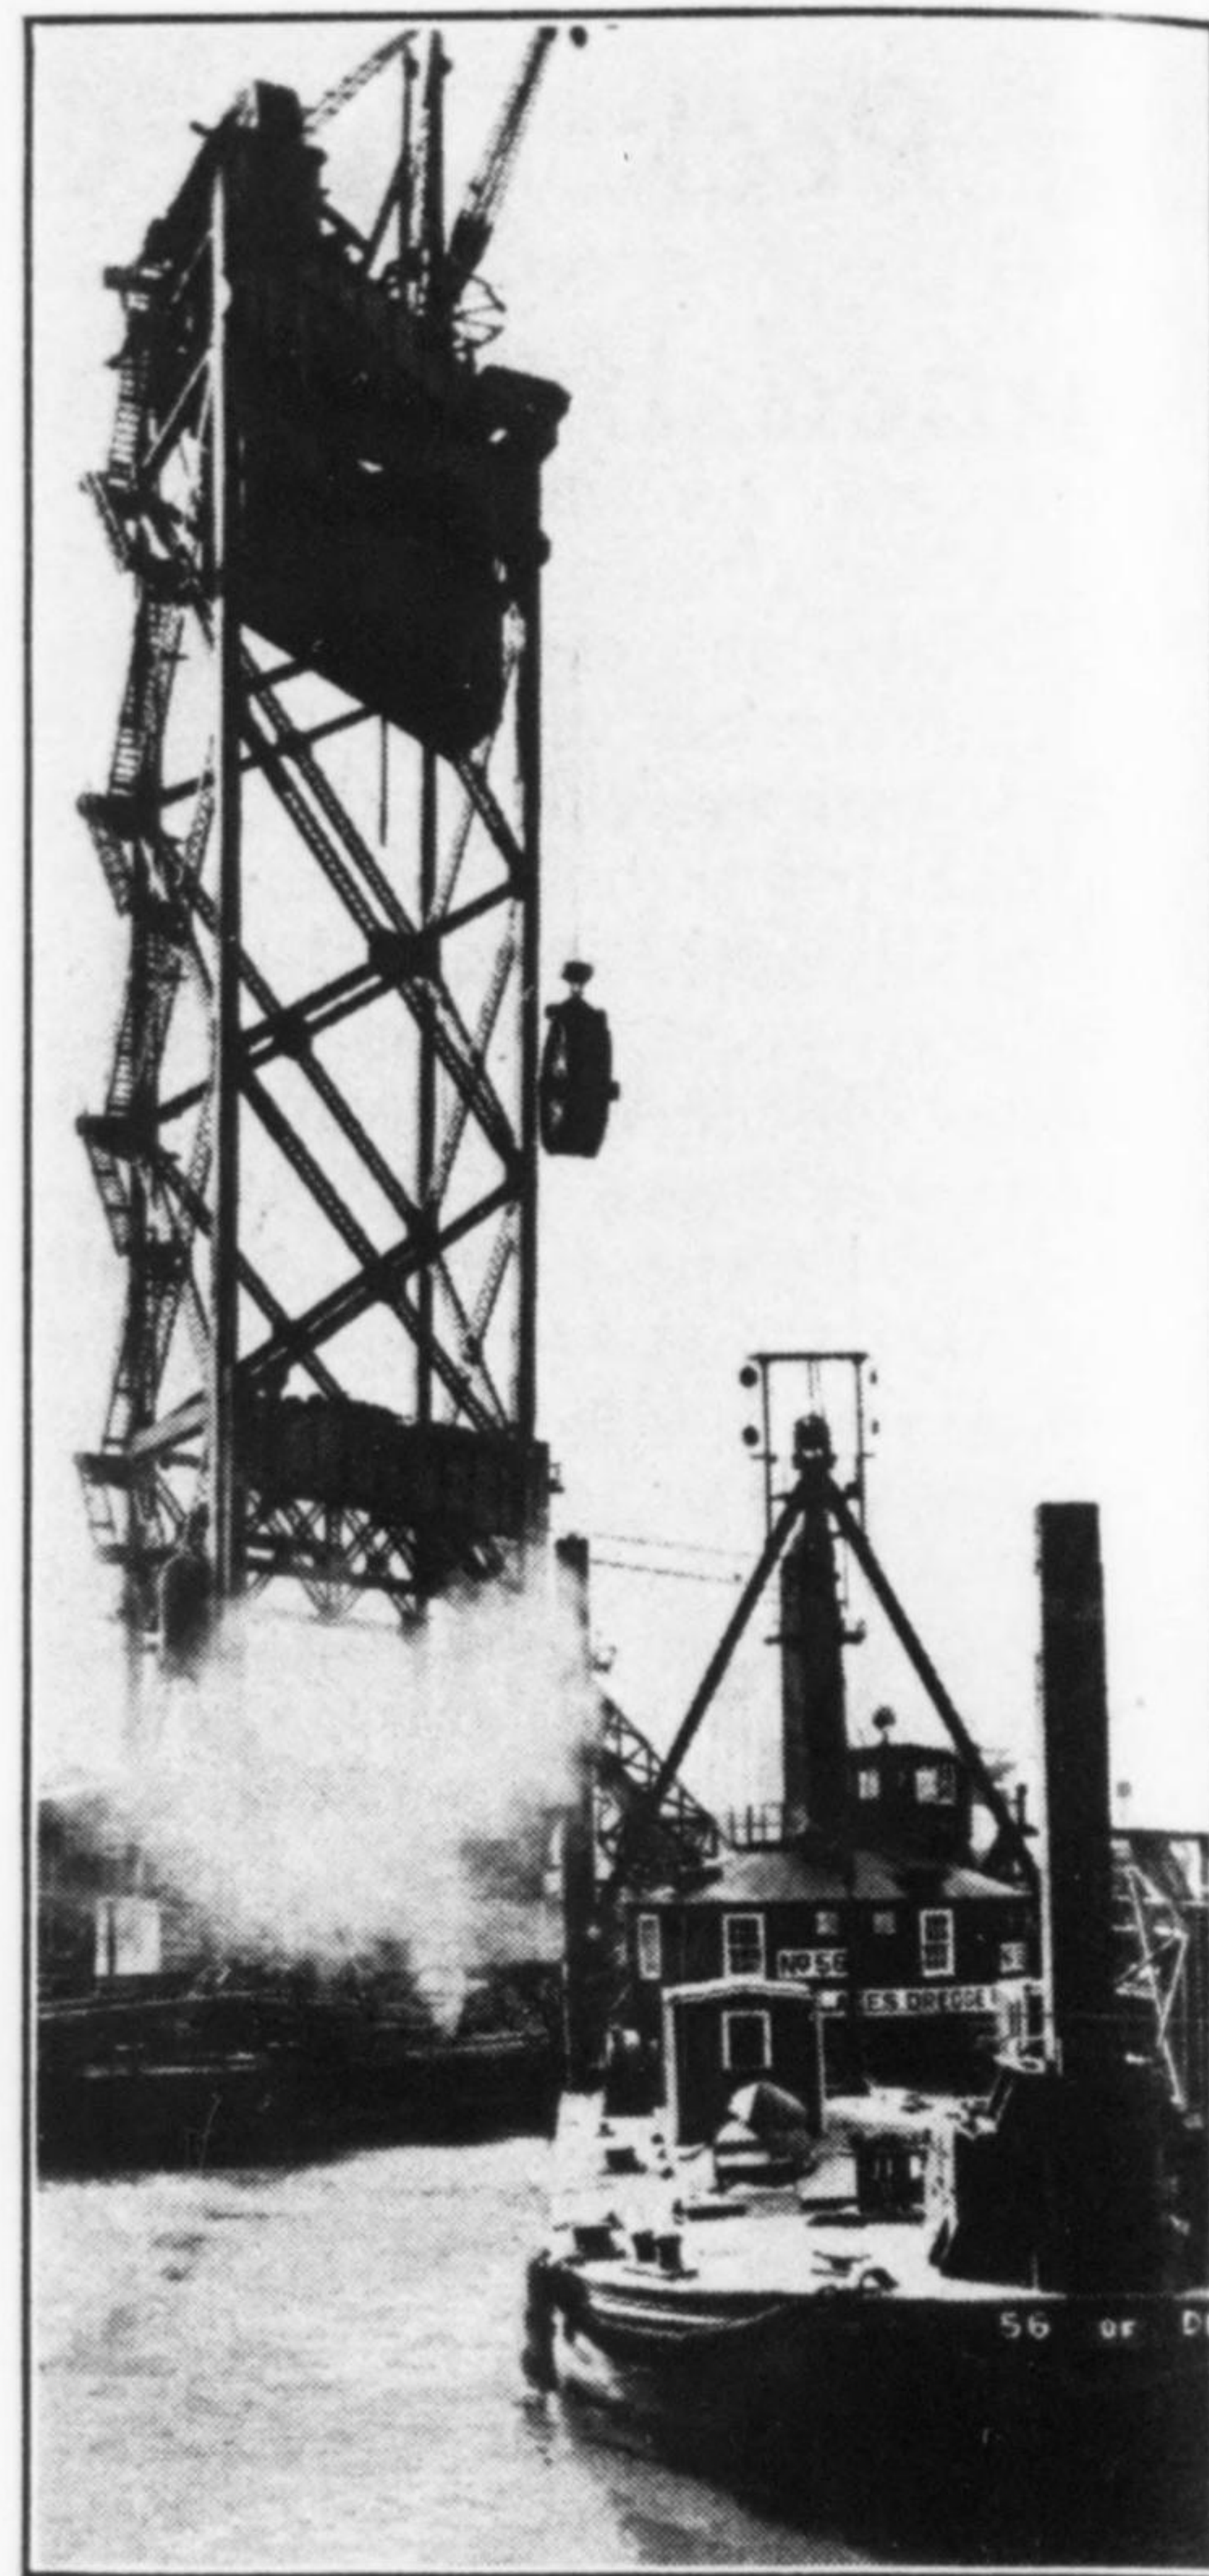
RAISING A 56-TON SHEAVE onto one of the towers of the Torrence Ave. lift bridge in Chicago using a 9-part line from a hoist on the derrick boat in the foreground
